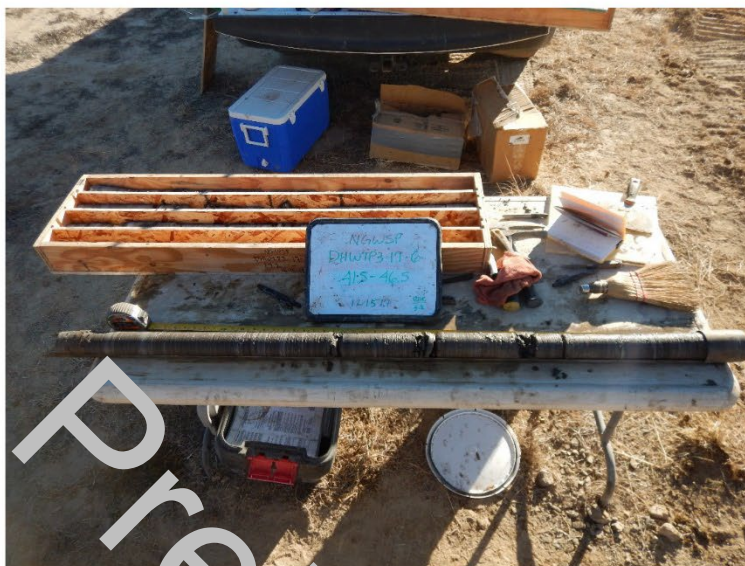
/15/2017 NGWSP, SJWTP, DHWTP3-17-6 (41.5-46.5 feet). Photo By: P. Gardner
